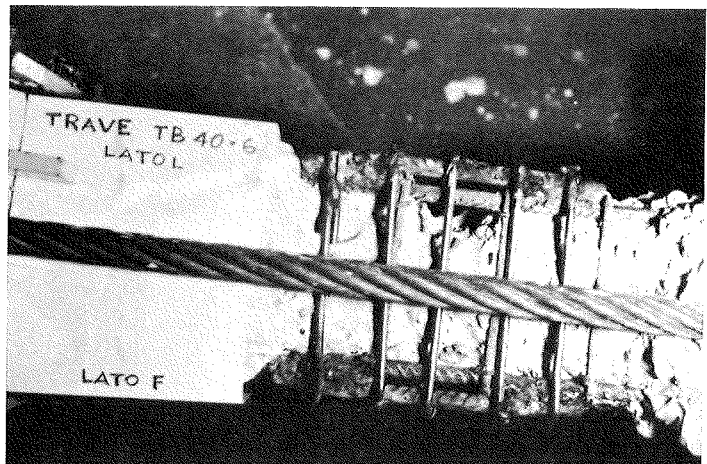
II Technique. Welded bars and new stirrups are shown.
